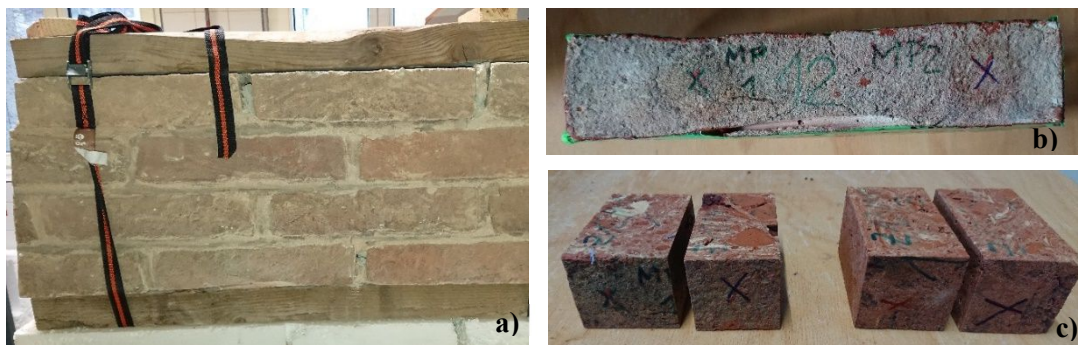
Masonry structure (a), brick from masonry structure (b), specimen for automatic measurement (c)
